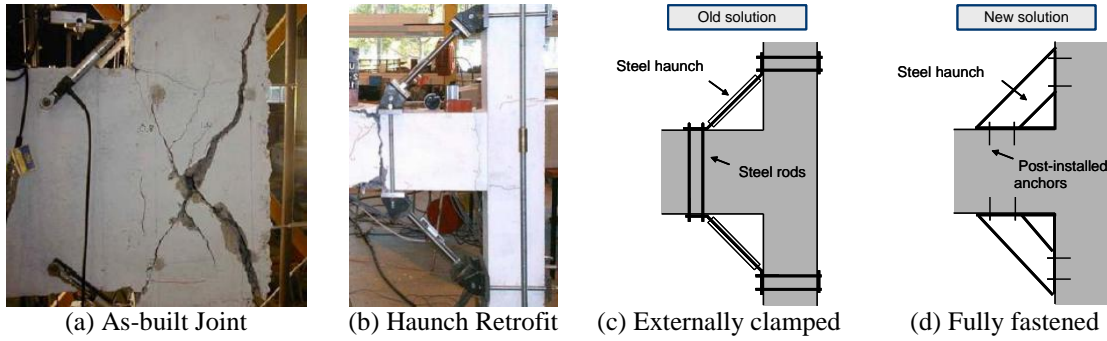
Haunch Retrofit Solution for exterior beam column joints (Pampanin et al., 2006); (Genesio and Akgüzel, 2009)
